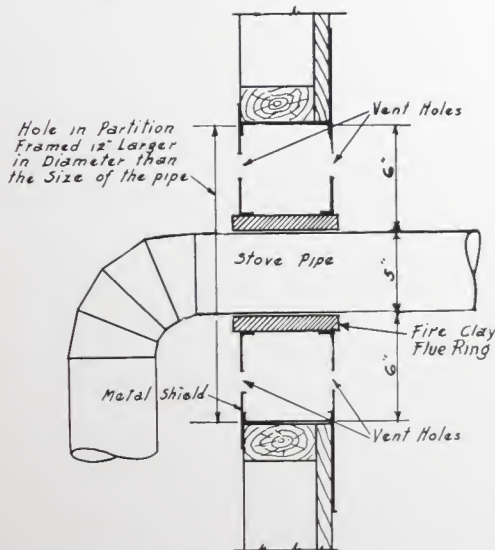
SECTION VIEW OF PROTECTION AROUND STOVE-PIPE PASSING THROUGH WOODEN PARTITION.
